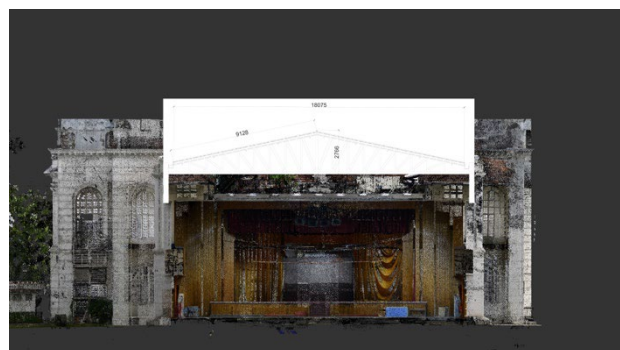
Ipoh Town Hall section view with a superimposed new roofing solution.
